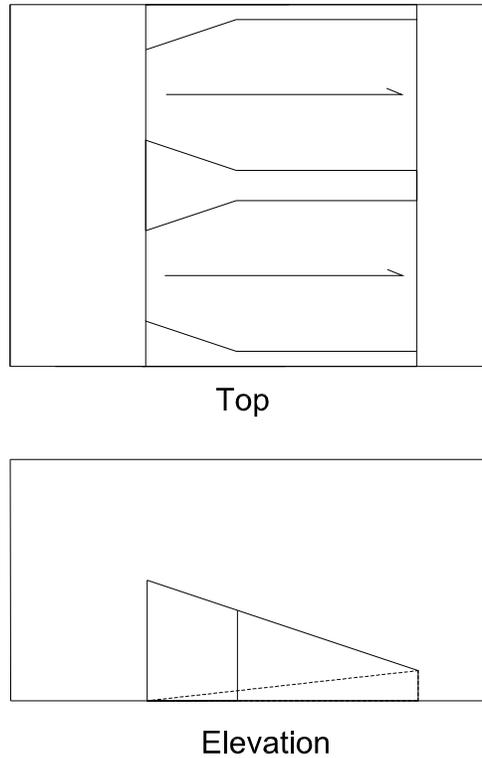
New block design with a 1V:9H ramp place between the blocks. Ramp begins at block face and is 4 ft high.
